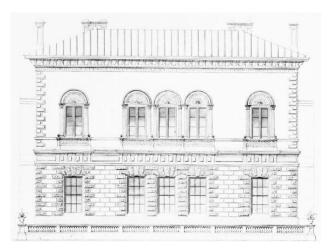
Garden elevation of Charles Barry's proposed Traveller's Club, London, c.1829
